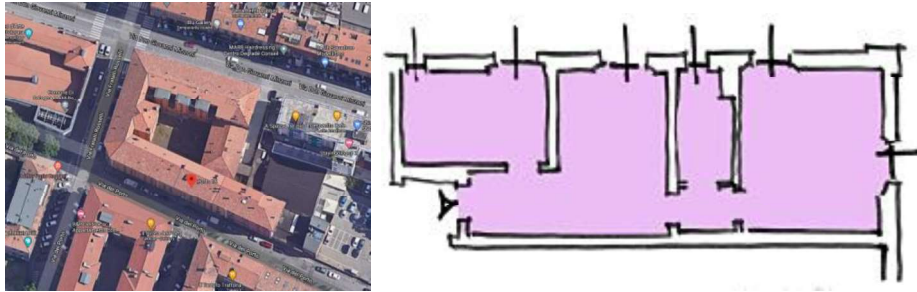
Porto 15 - (a) Building, and (b) Plan of an apartment
